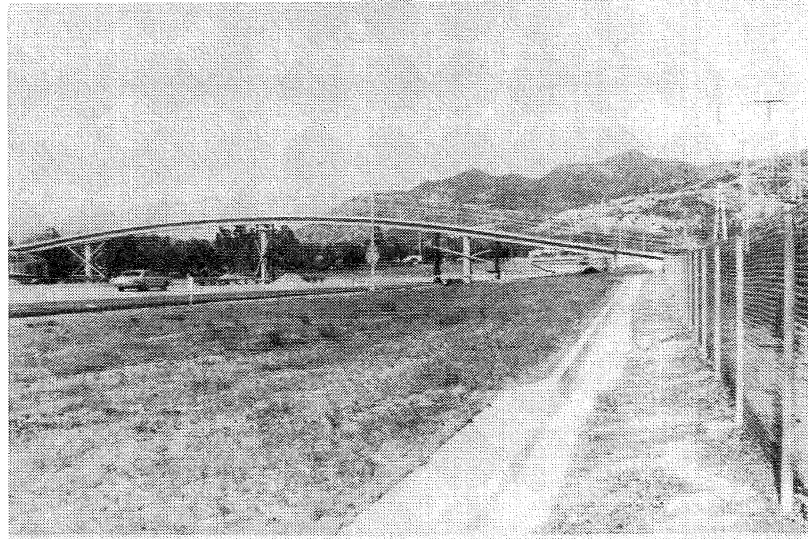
Tyler Street Pedestrian Overcrossing, Foothill freeway. Longitudinal movements caused bending failures at the column tops and separation at the abutments.
